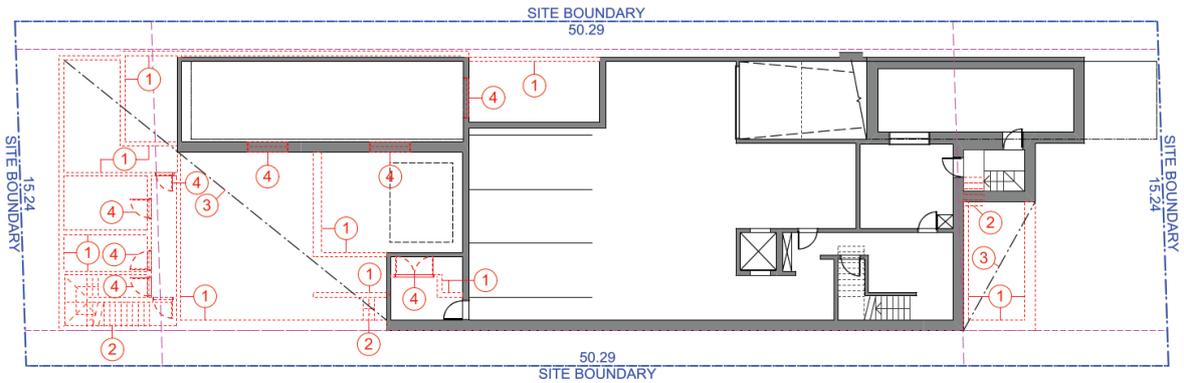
Extract of the proposed demolition plan – basement level (source: AE Design Studio).
